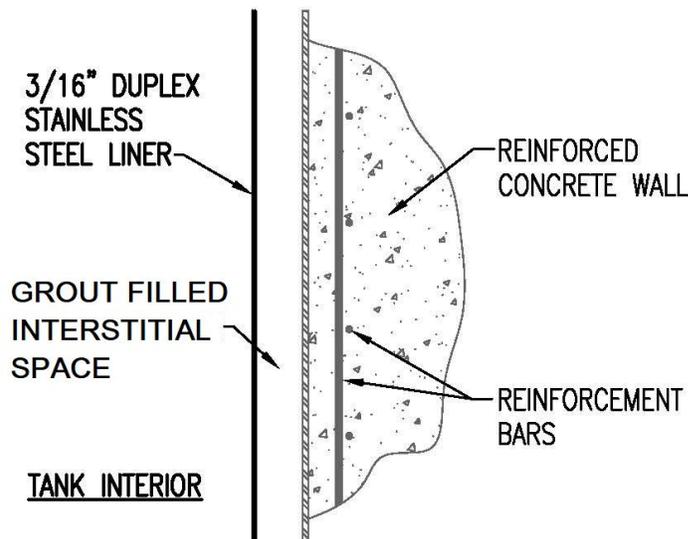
Tank Upgrade Alternative 2B - Typical Wall Section
